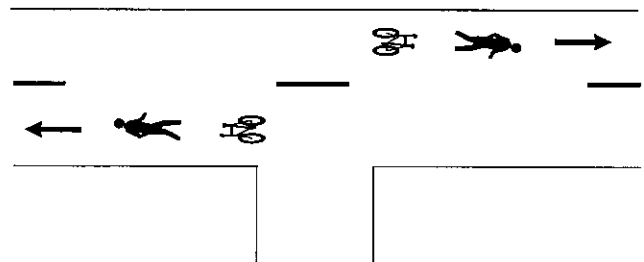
Bicycle, pedestrian, and arrow pavement symbols should be located adjacent to the path access points
